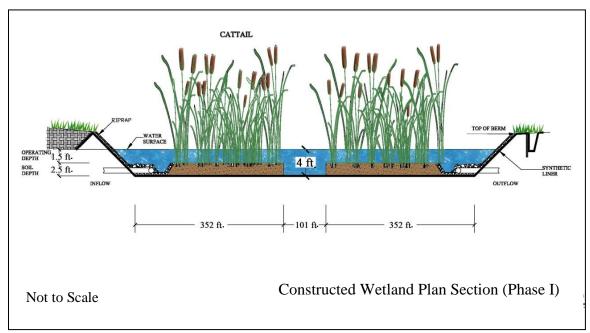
Plan section of the proposed constructed wetland based on current sewage volume.
